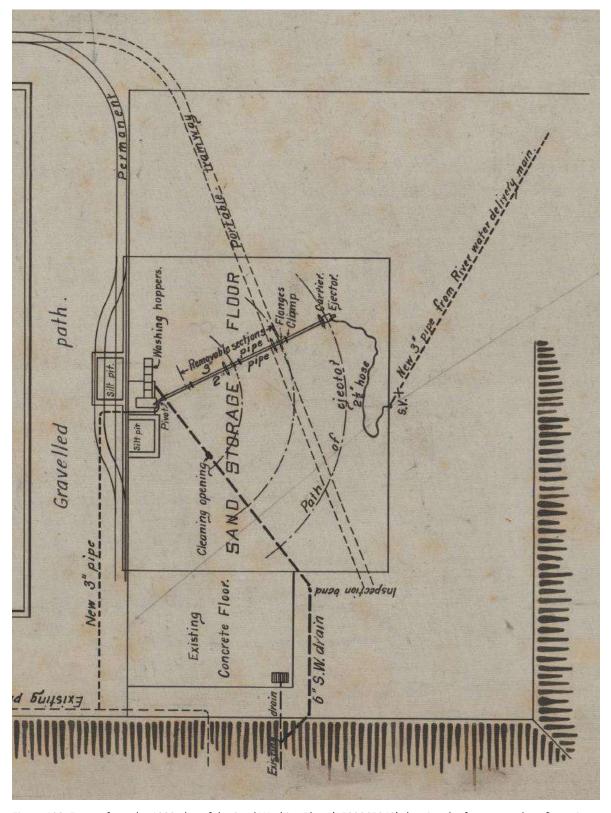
Extract from the 1909 plan of the Sand Washing Plant (AF00065949) showing the features and configuration..
